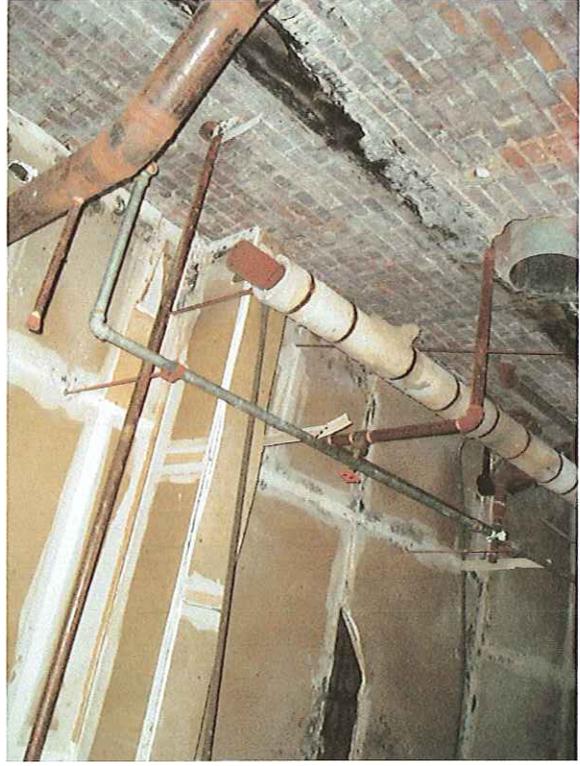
air cell insulation (assumed asbestos) on steam pipe in new boiler room in garage, east end of mill building.
